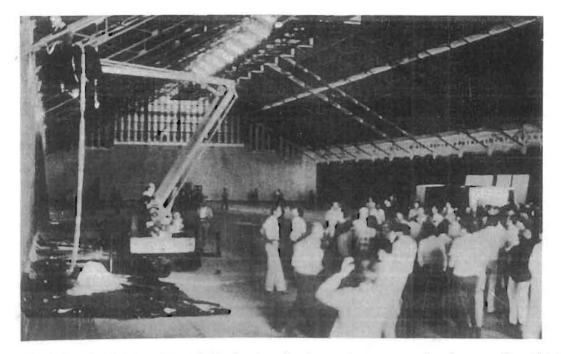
Interior view of Meckering horizontal storage showing applications of polyurethane foam to the roof/wall joints.
